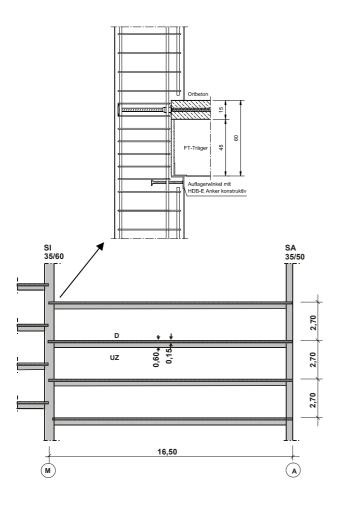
Parking Structure I: structural detailing and architectural view [7]
